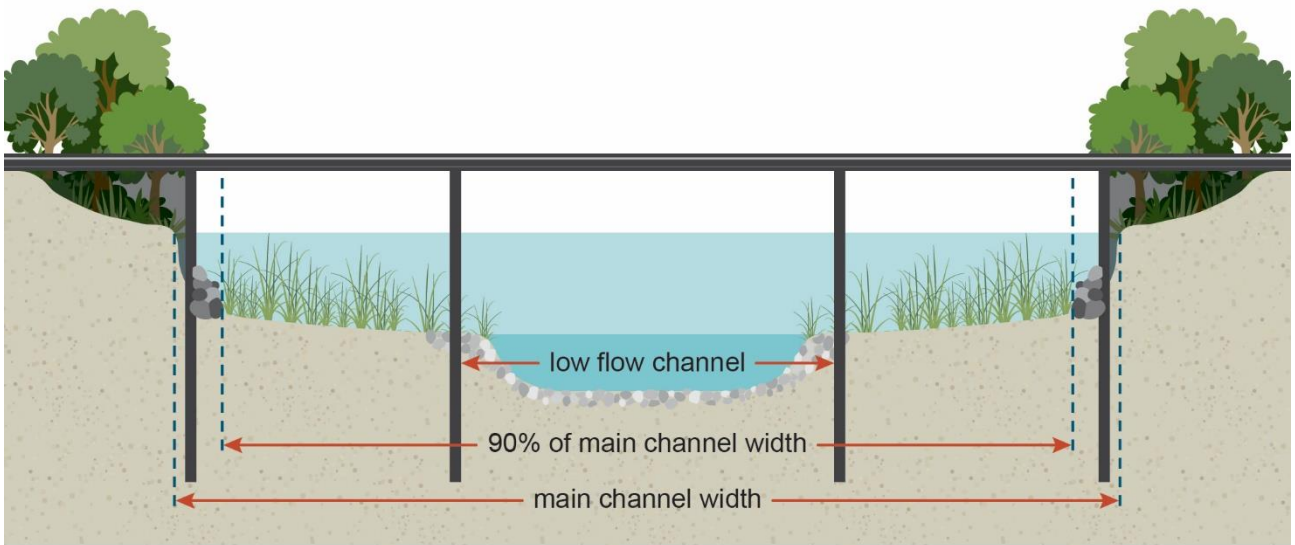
Multi-span bridge (cross-section of waterway) – amber and green waterways
